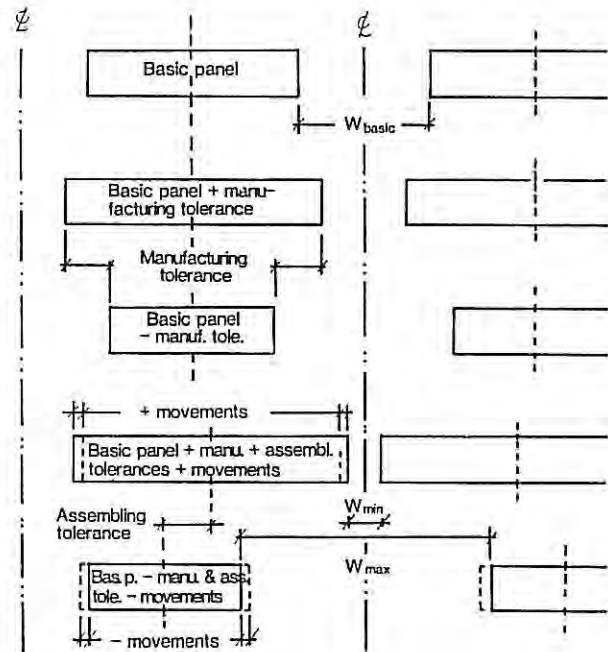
Manufacturing and assembling tolerances and movements. Principle figure
